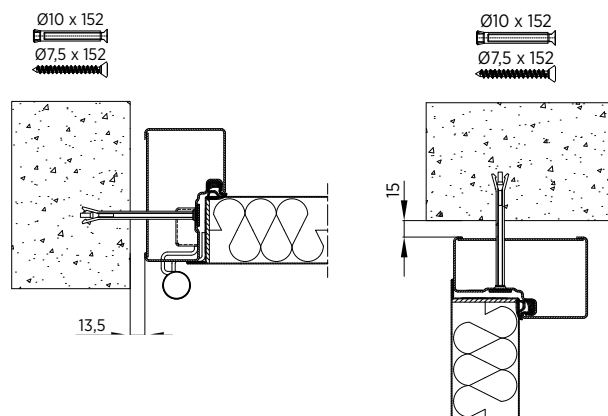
Installation of the internal frame, single-leaf door sides and lintel
